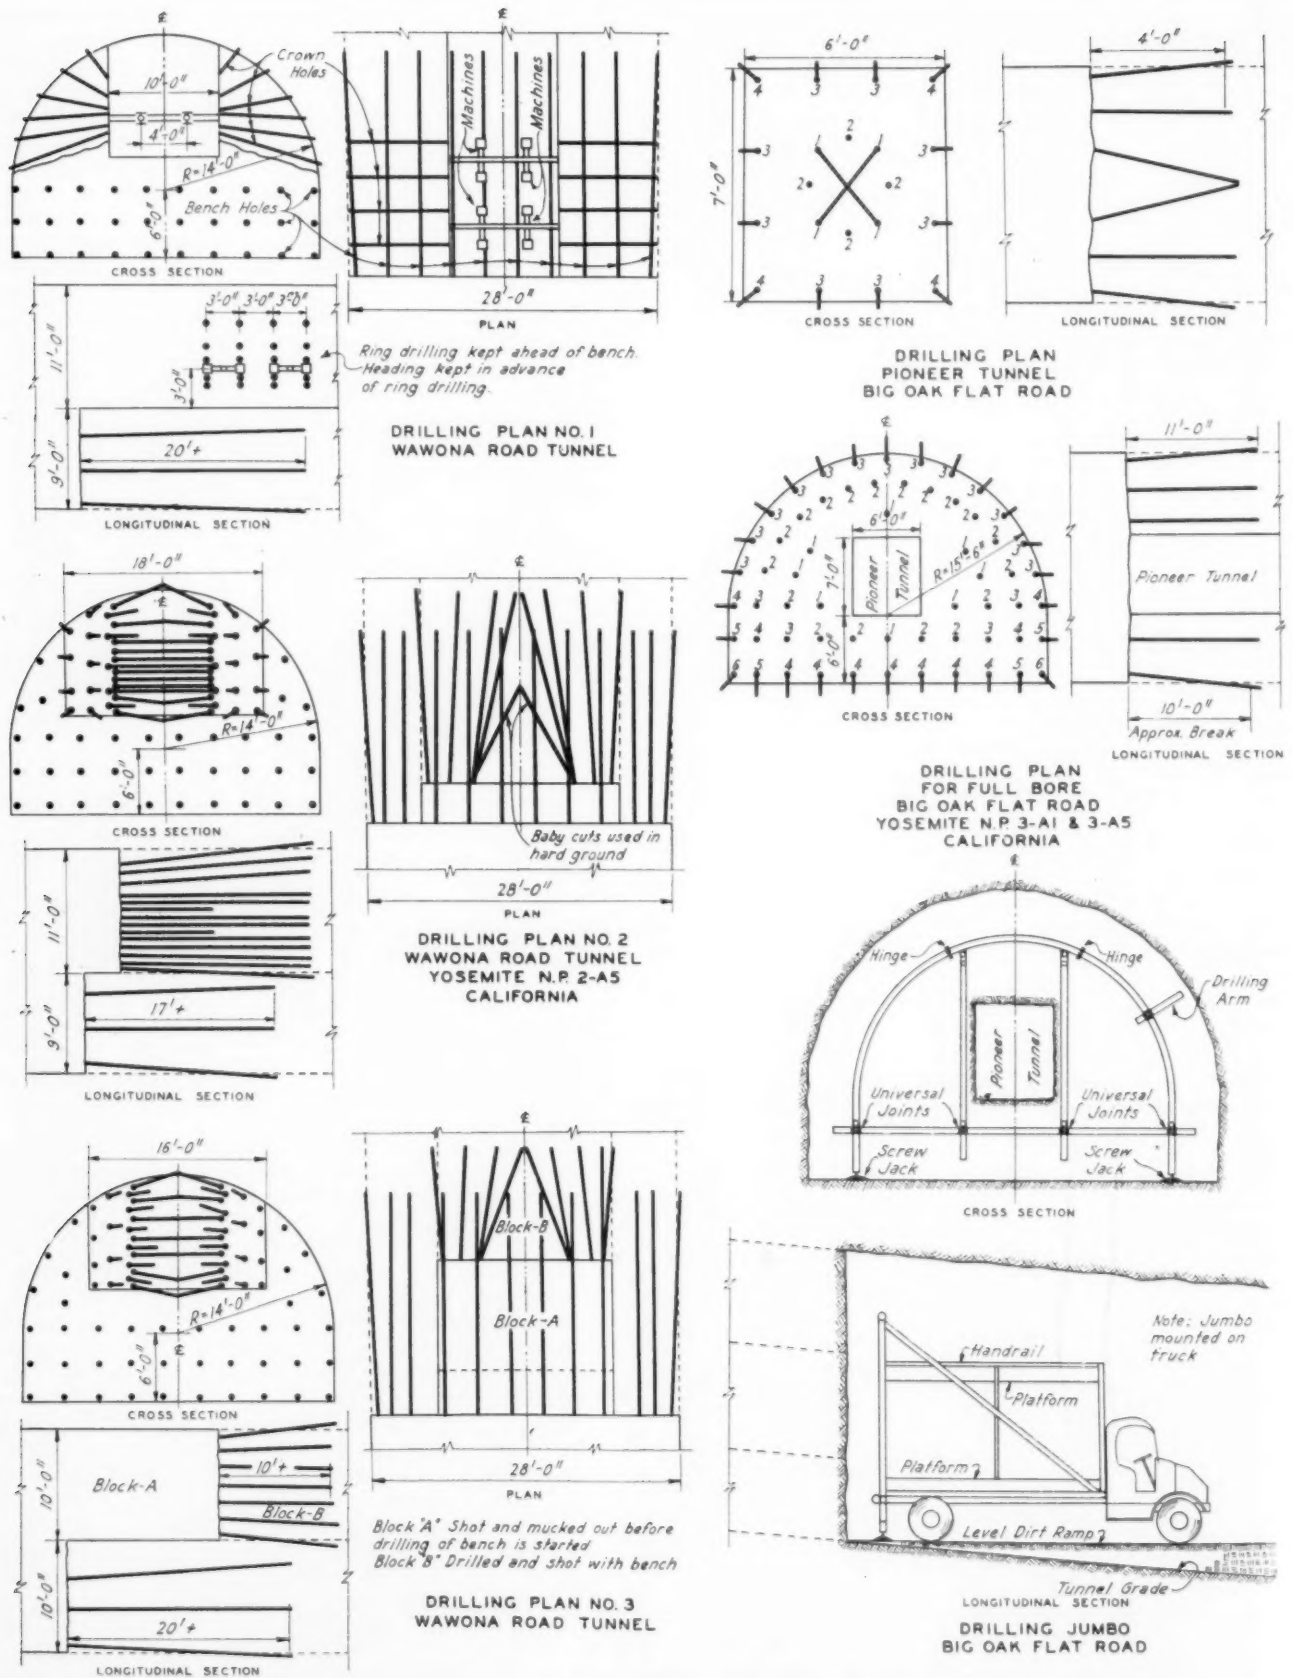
DRILLING PLANS FOLLOWED IN THE CONSTRUCTION OF WESTERN HIGHWAY TUNNELS; ALSO DRILLING JUMBO MOUNTED ON TRUCK.
